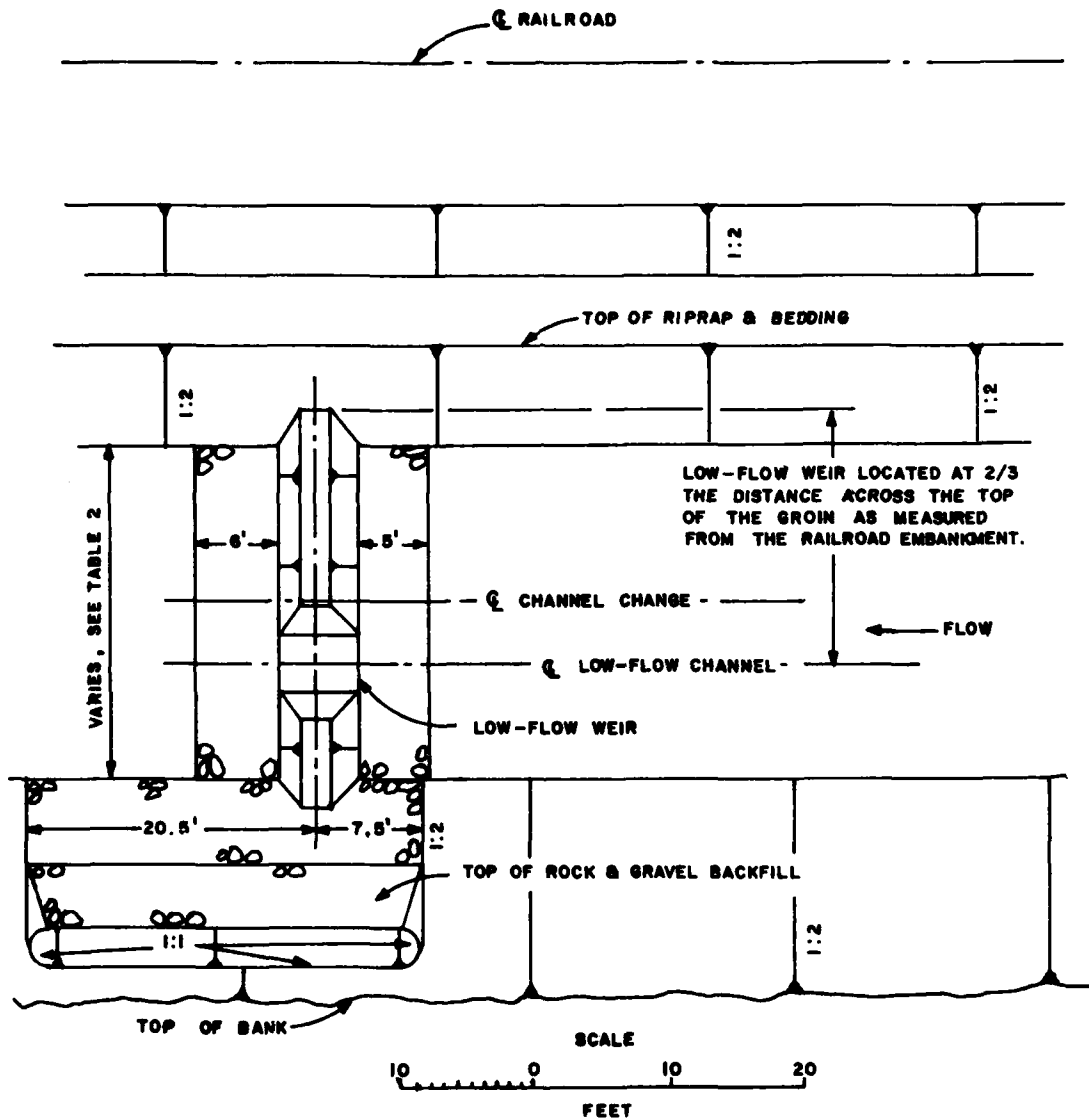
Typical plan view of groin and railroad embankment (adapted from Great Northern Line Change, Ariana Creek to Jennings, Groins, Drawing E-53-33-81, December 1965, NPS)
